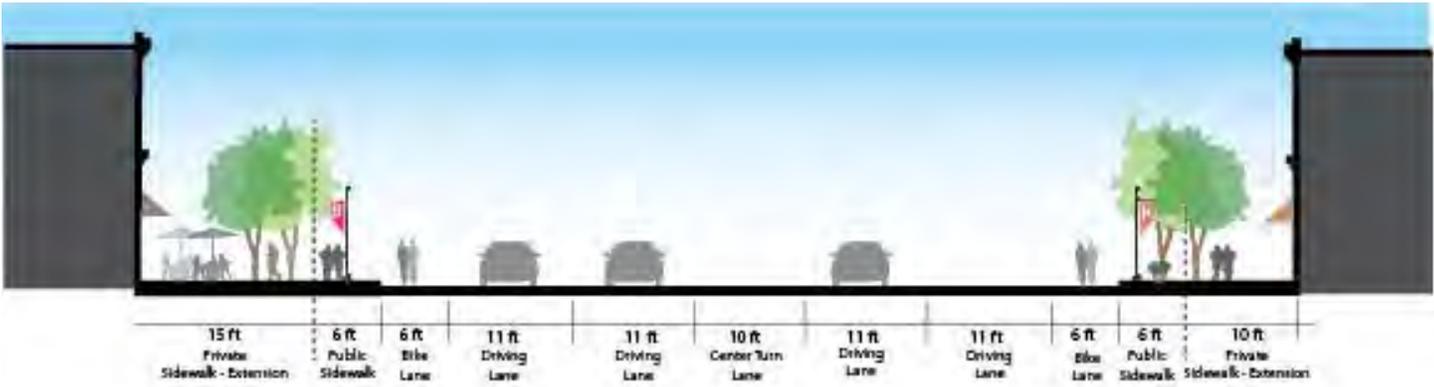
Street Section showing the potential of preferred buildings location with public and semi public streetscape, as well as cycling facilities and TWLTL lane (two way left turn lane), within an 78 ft right of way.
